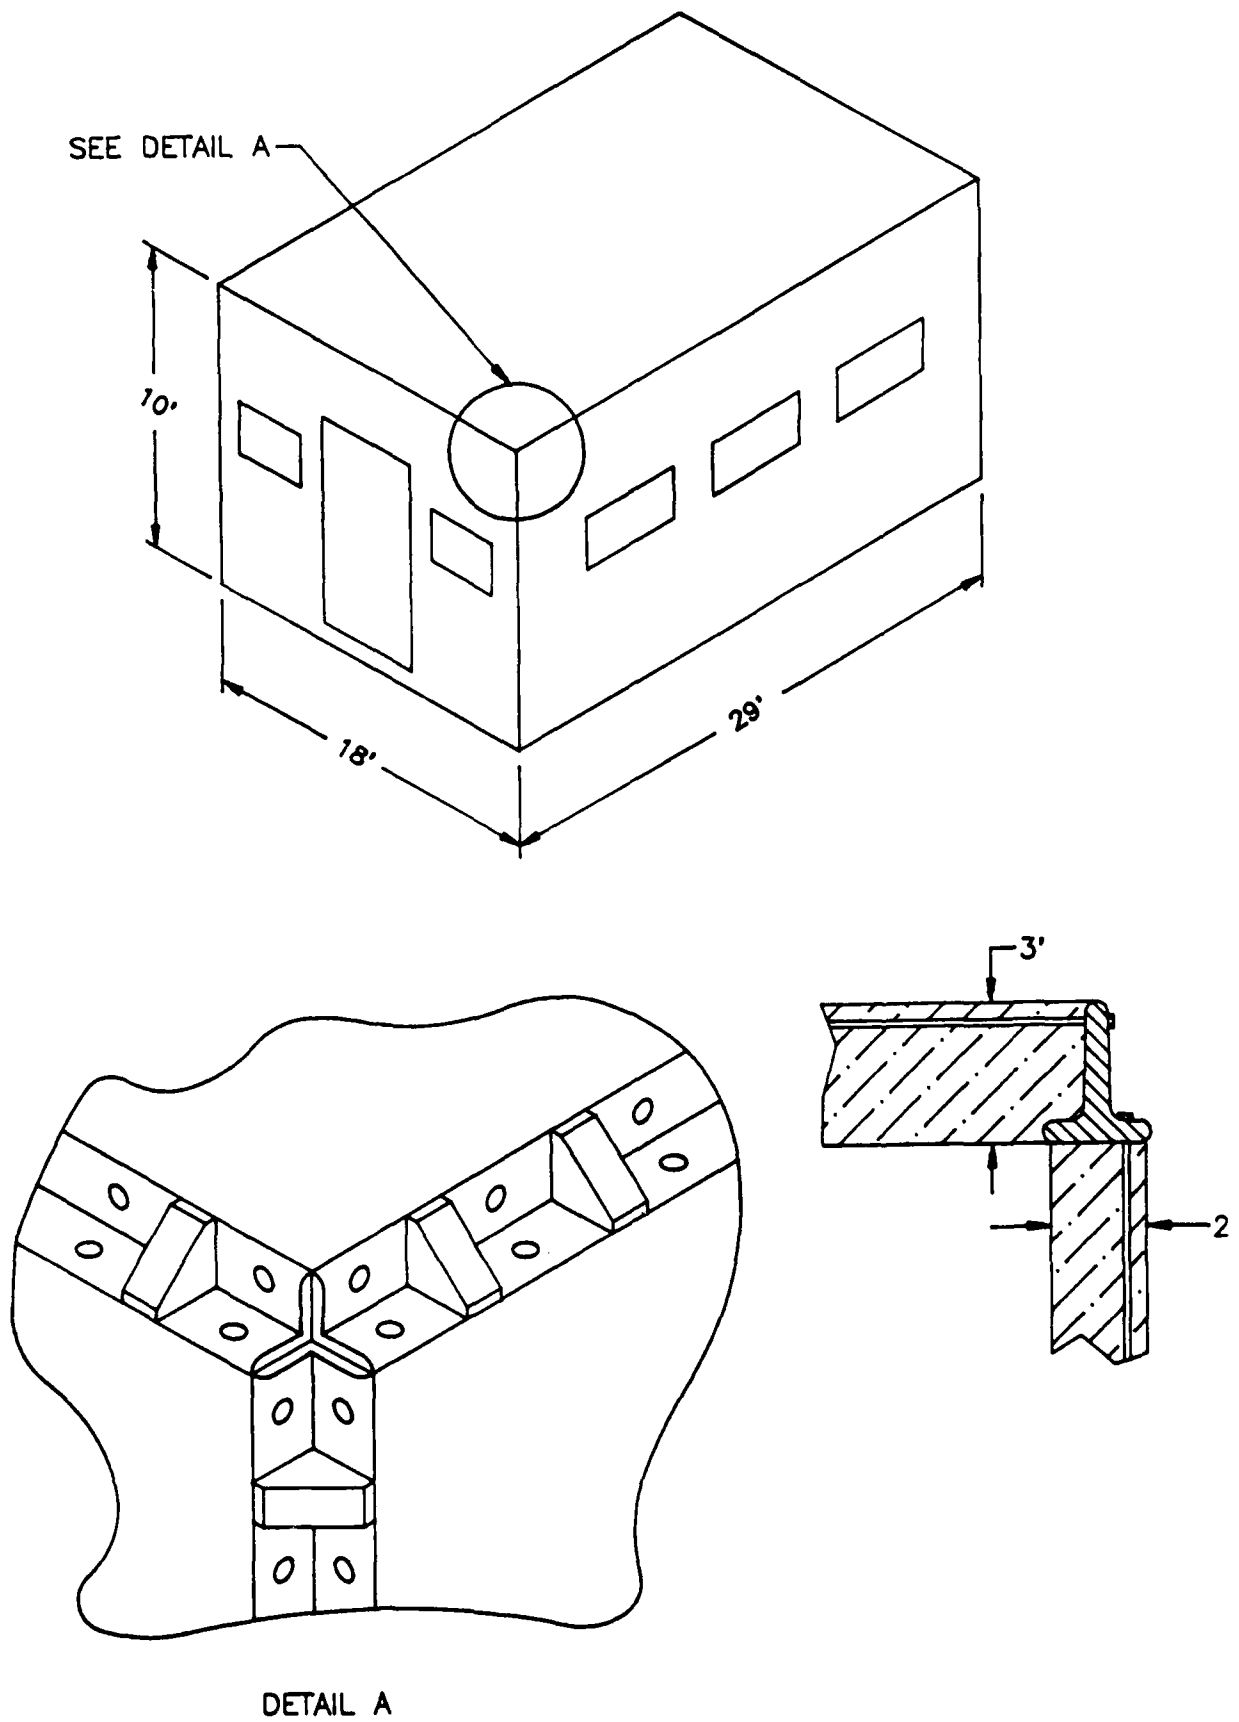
POSTTENSIONED FLAT SLAB CONCEPT SHOWING CORNER DETAIL
